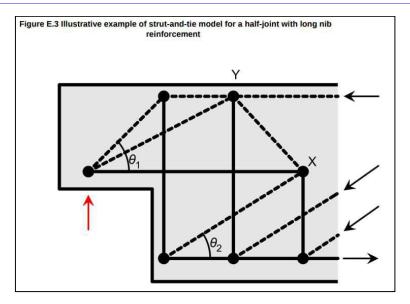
of CS 466 showing idealised strut and tie model, assuming longitudinal reinforcement is as shown on record drawings).
